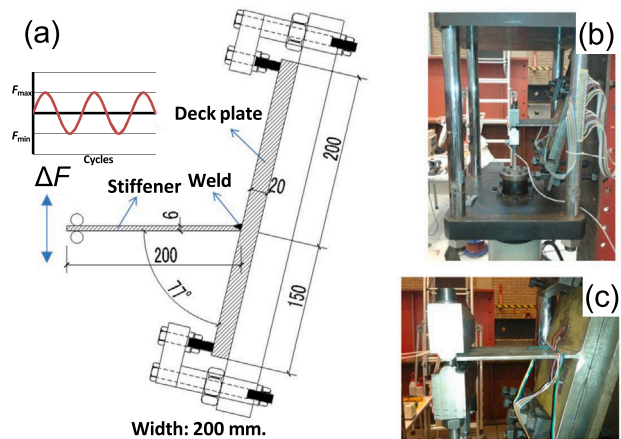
Stiffener-to-deck welded connection and the setup for fatigue testing (unit: mm).
